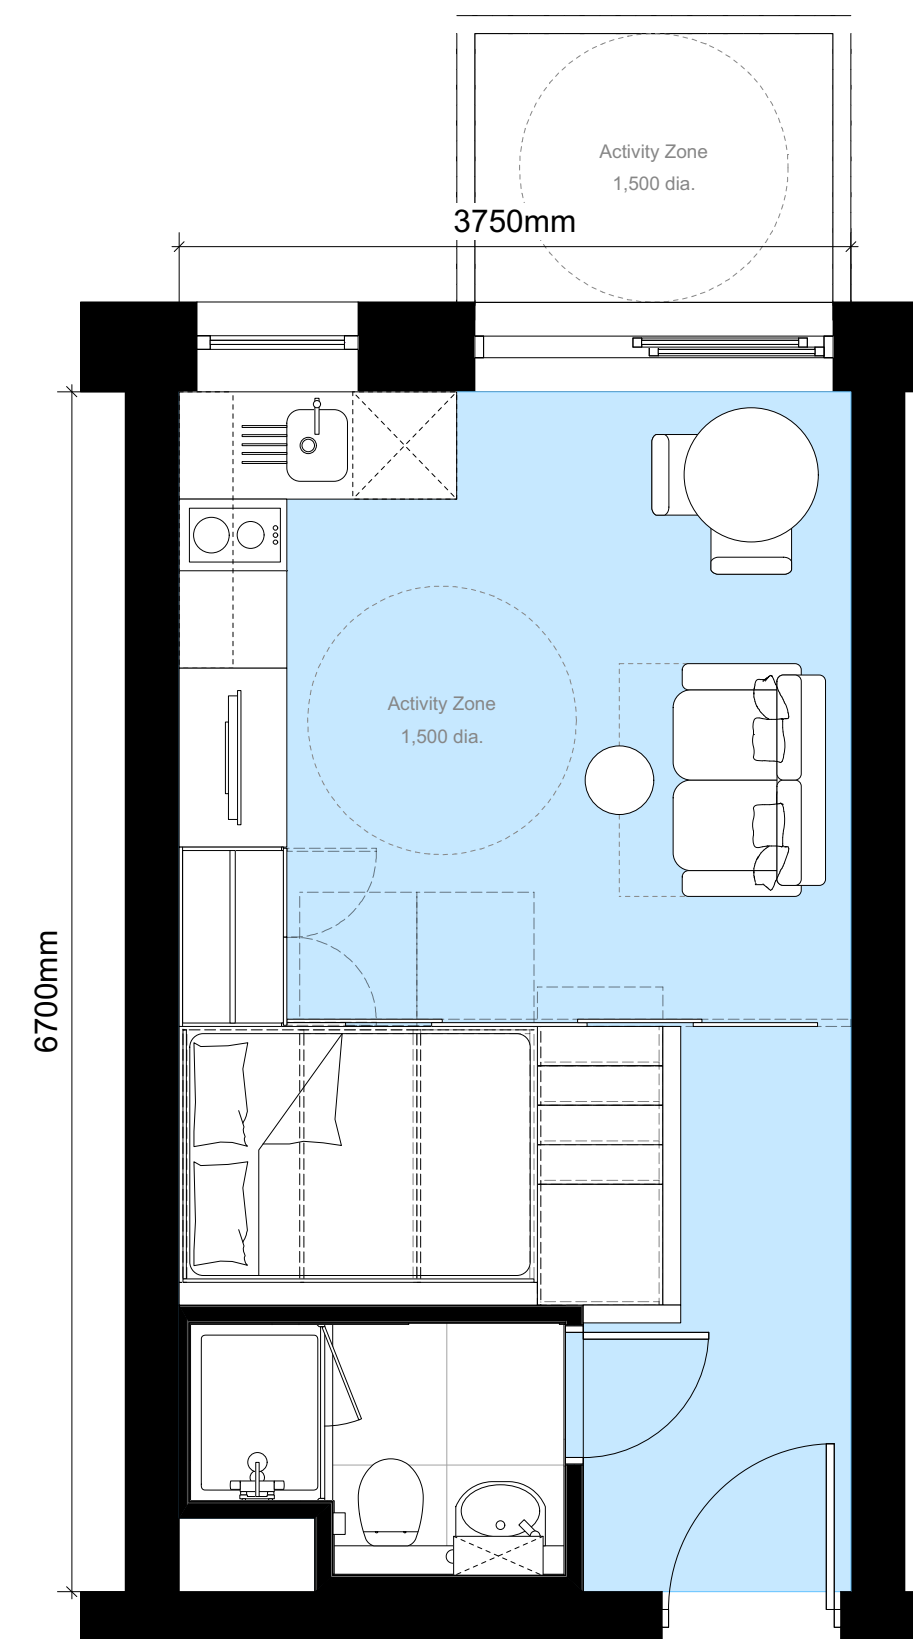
TYPICAL 25SQM ROOM LAYOUT
